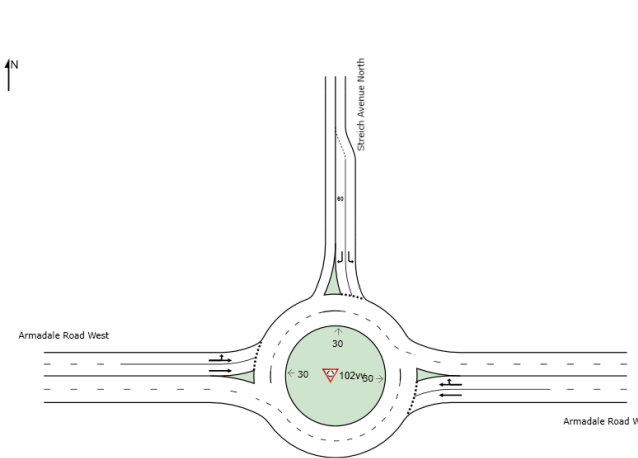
Armadale Road/ Streach Avenue – Roundabout option
